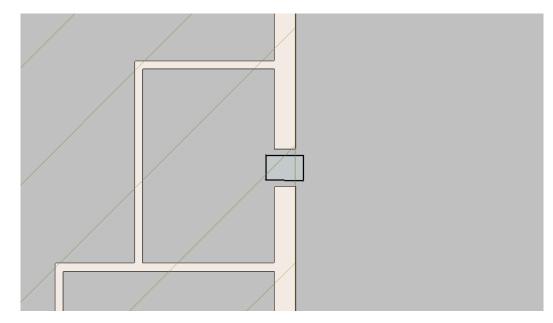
Plan view of the column converted in IFC Builder: The column is not present.
